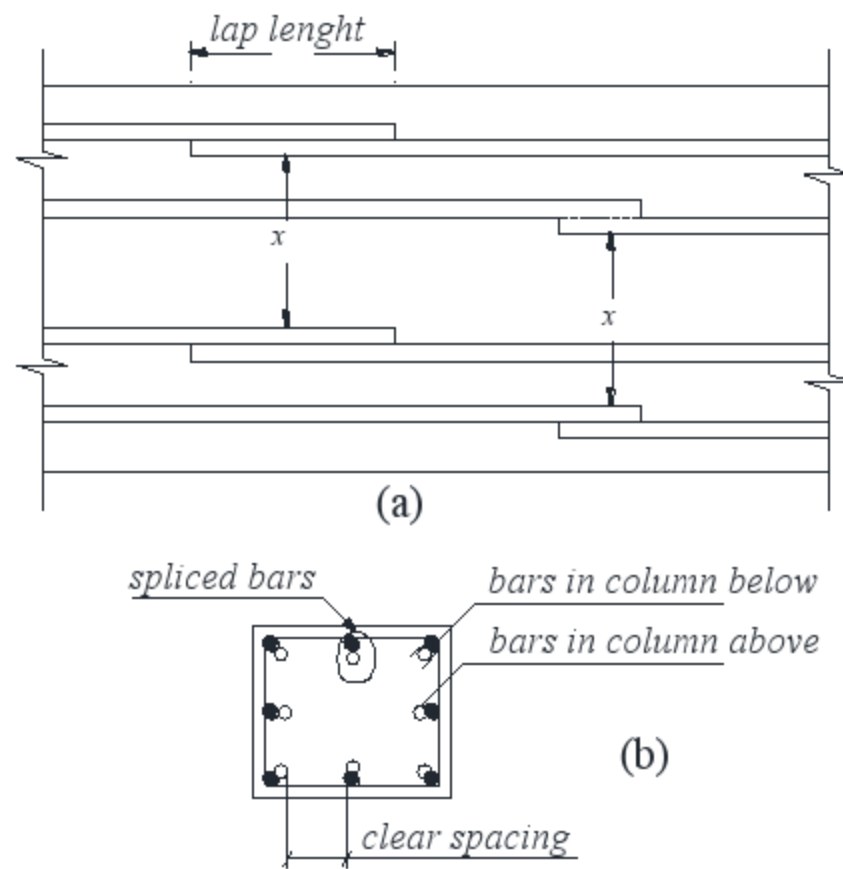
(a) Lap splice of slab and wall reinforcement ; (b) lap splices of column and beam reinforcement
